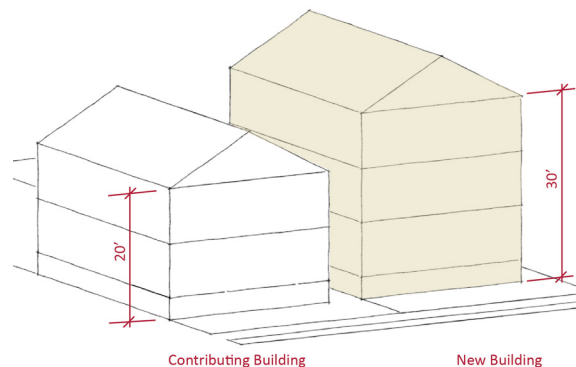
The height of new buildings should be no more than 150% of the height of surrounding contributing buildings.
